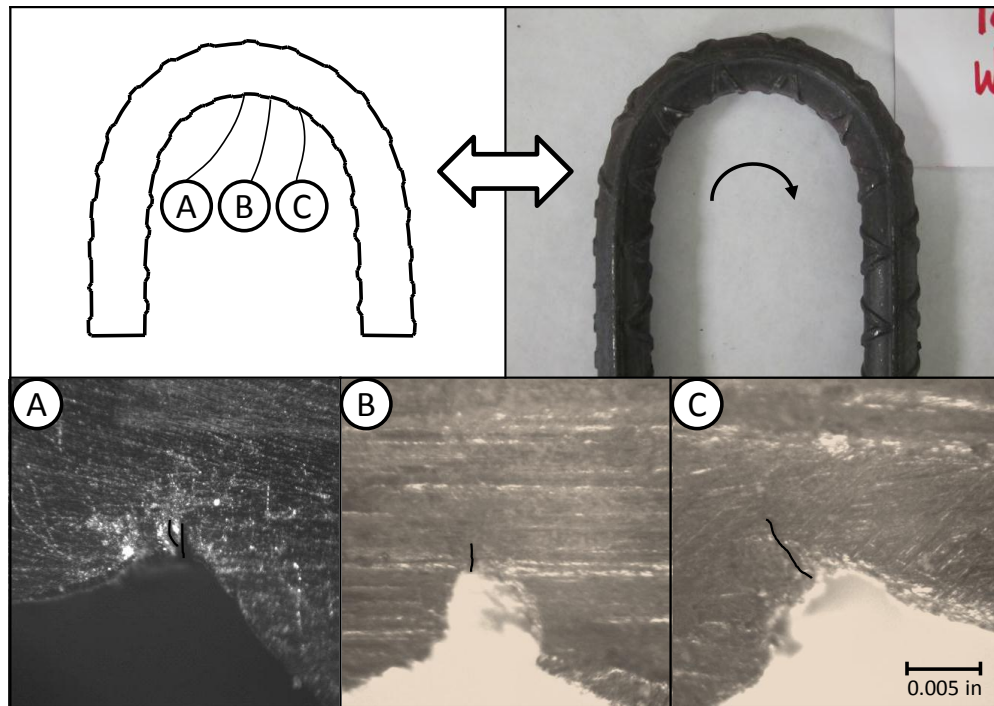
Cracks Identified After Bending for Specimen I-C-180-2.188-W
